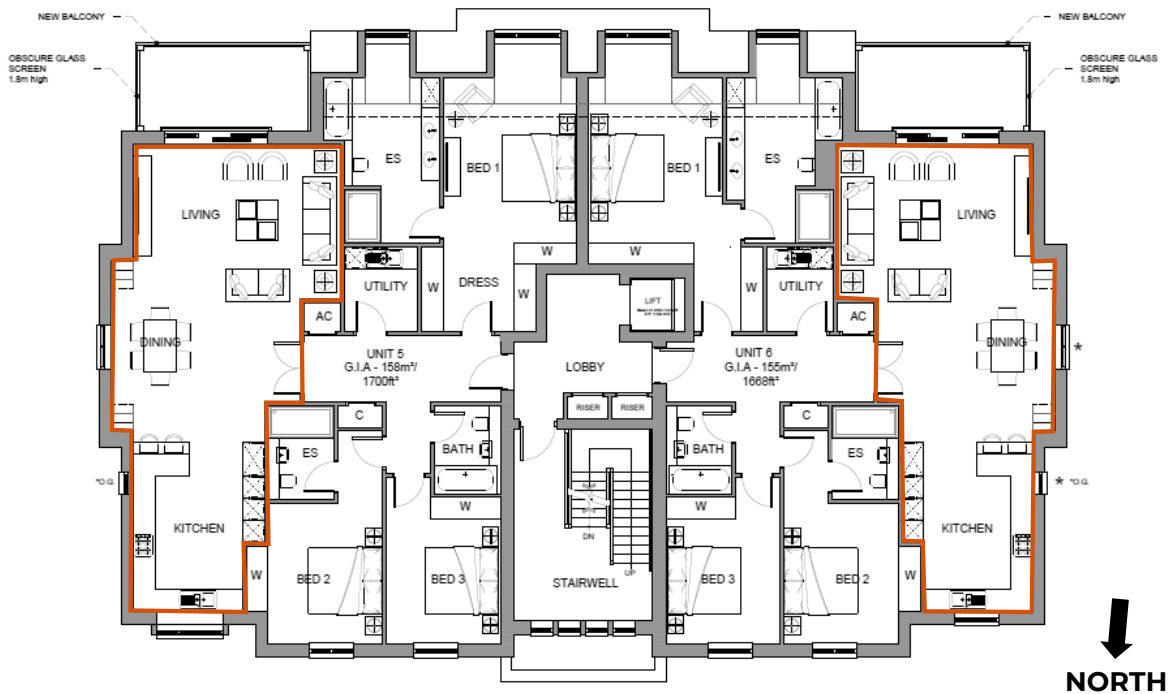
First Floor Plan by Ascot Design; rooms assessed (red)
